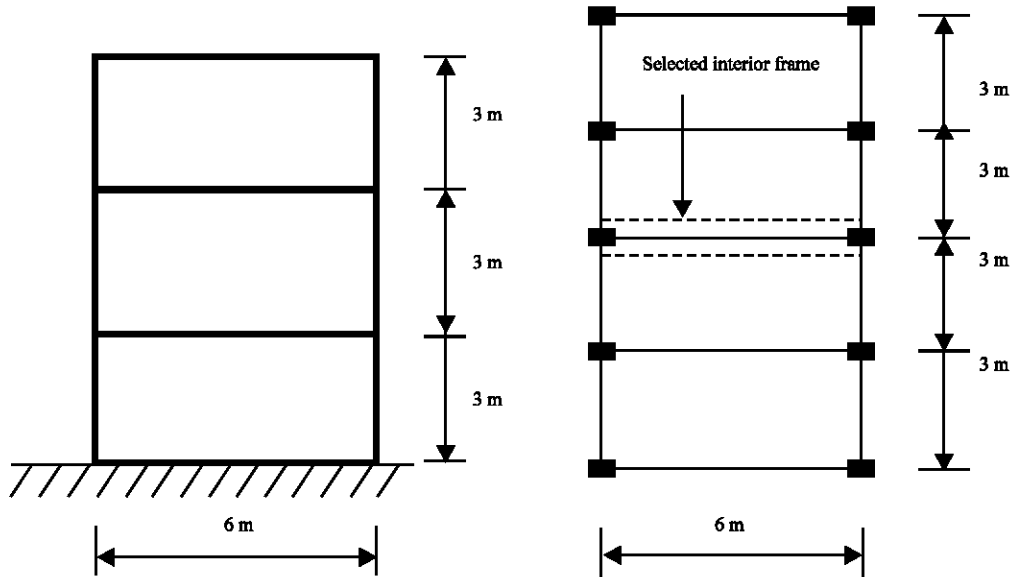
The RC framed structure, (a) elevation and (b) plan
